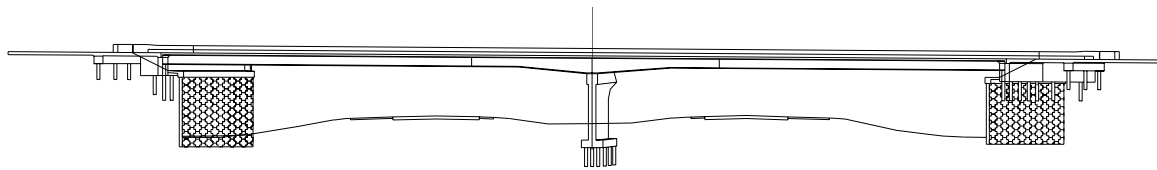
Arbor Road Bridge Elevation and Cross Section using the Steel Girders
